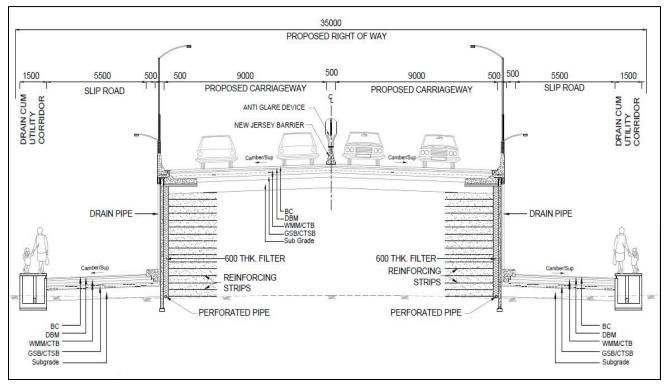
TCS-11: Typical Cross Section for 4 Lane Grade Separated Approach with Service Road
